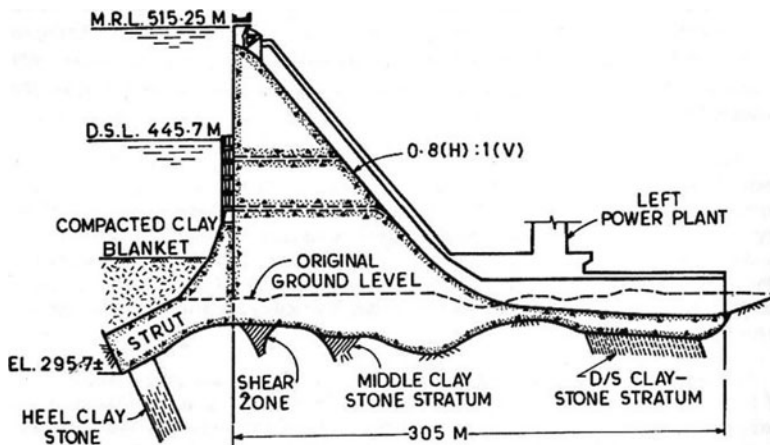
Bhakra Dam – maximum spillway section showing treatment of heel claystone.
